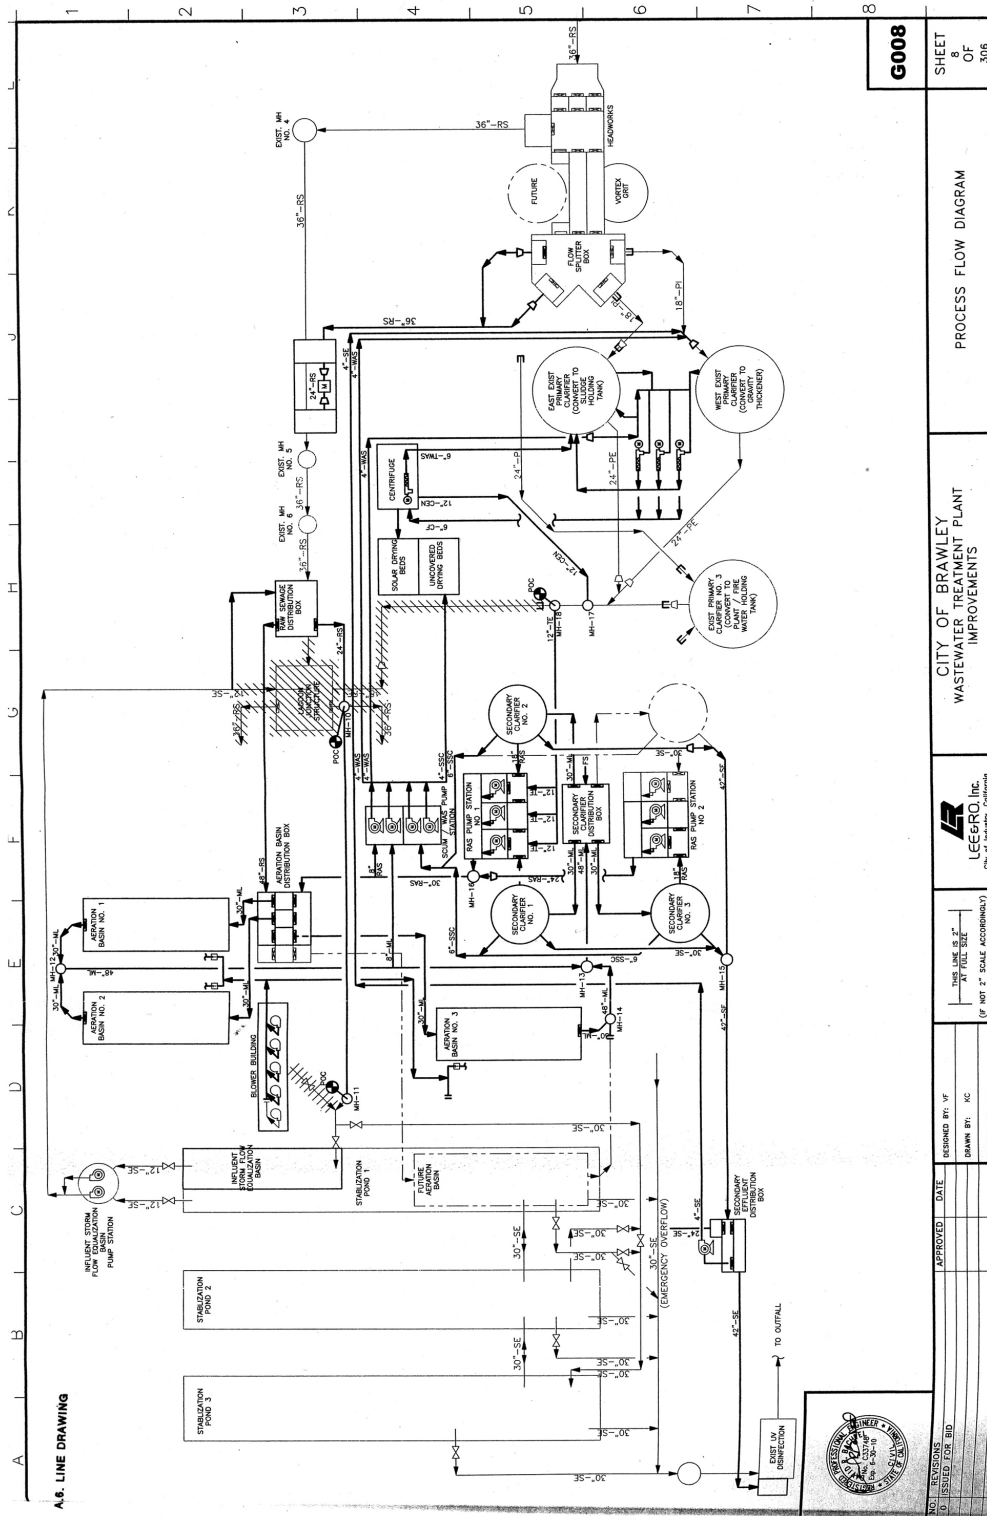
EXISTING WWTP FACILITIES AND YARD PIPING
